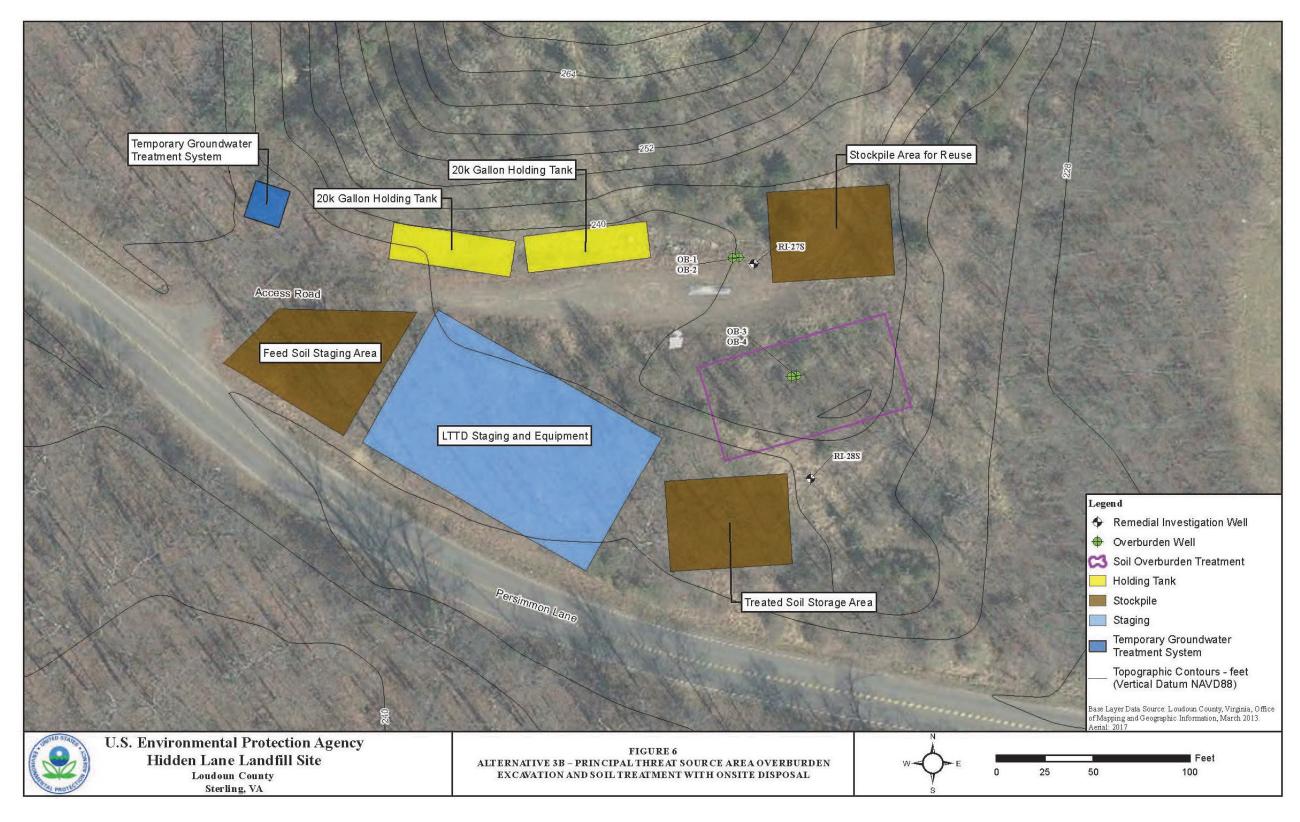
Alternative 3B – Principal Threat Source Area Overburden Excavation and Soil Treatment with Onsite Disposal
